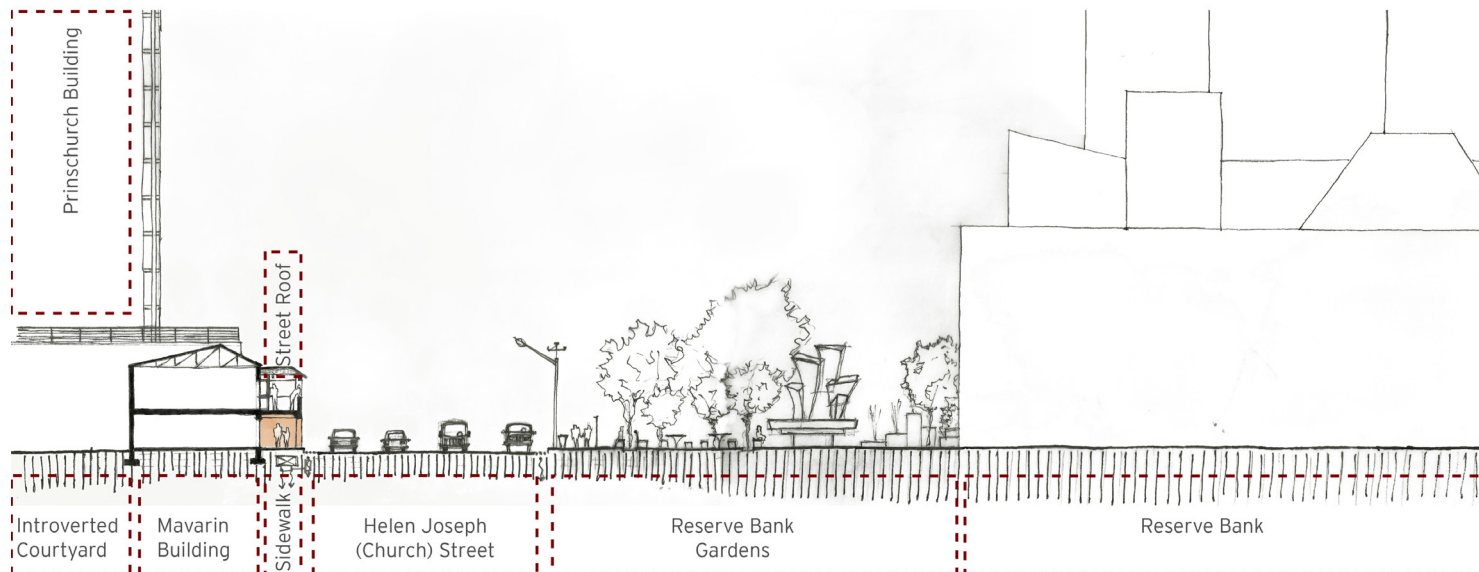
HELEN JOSEPH STREET SECTION (AUTHOR 2015)
